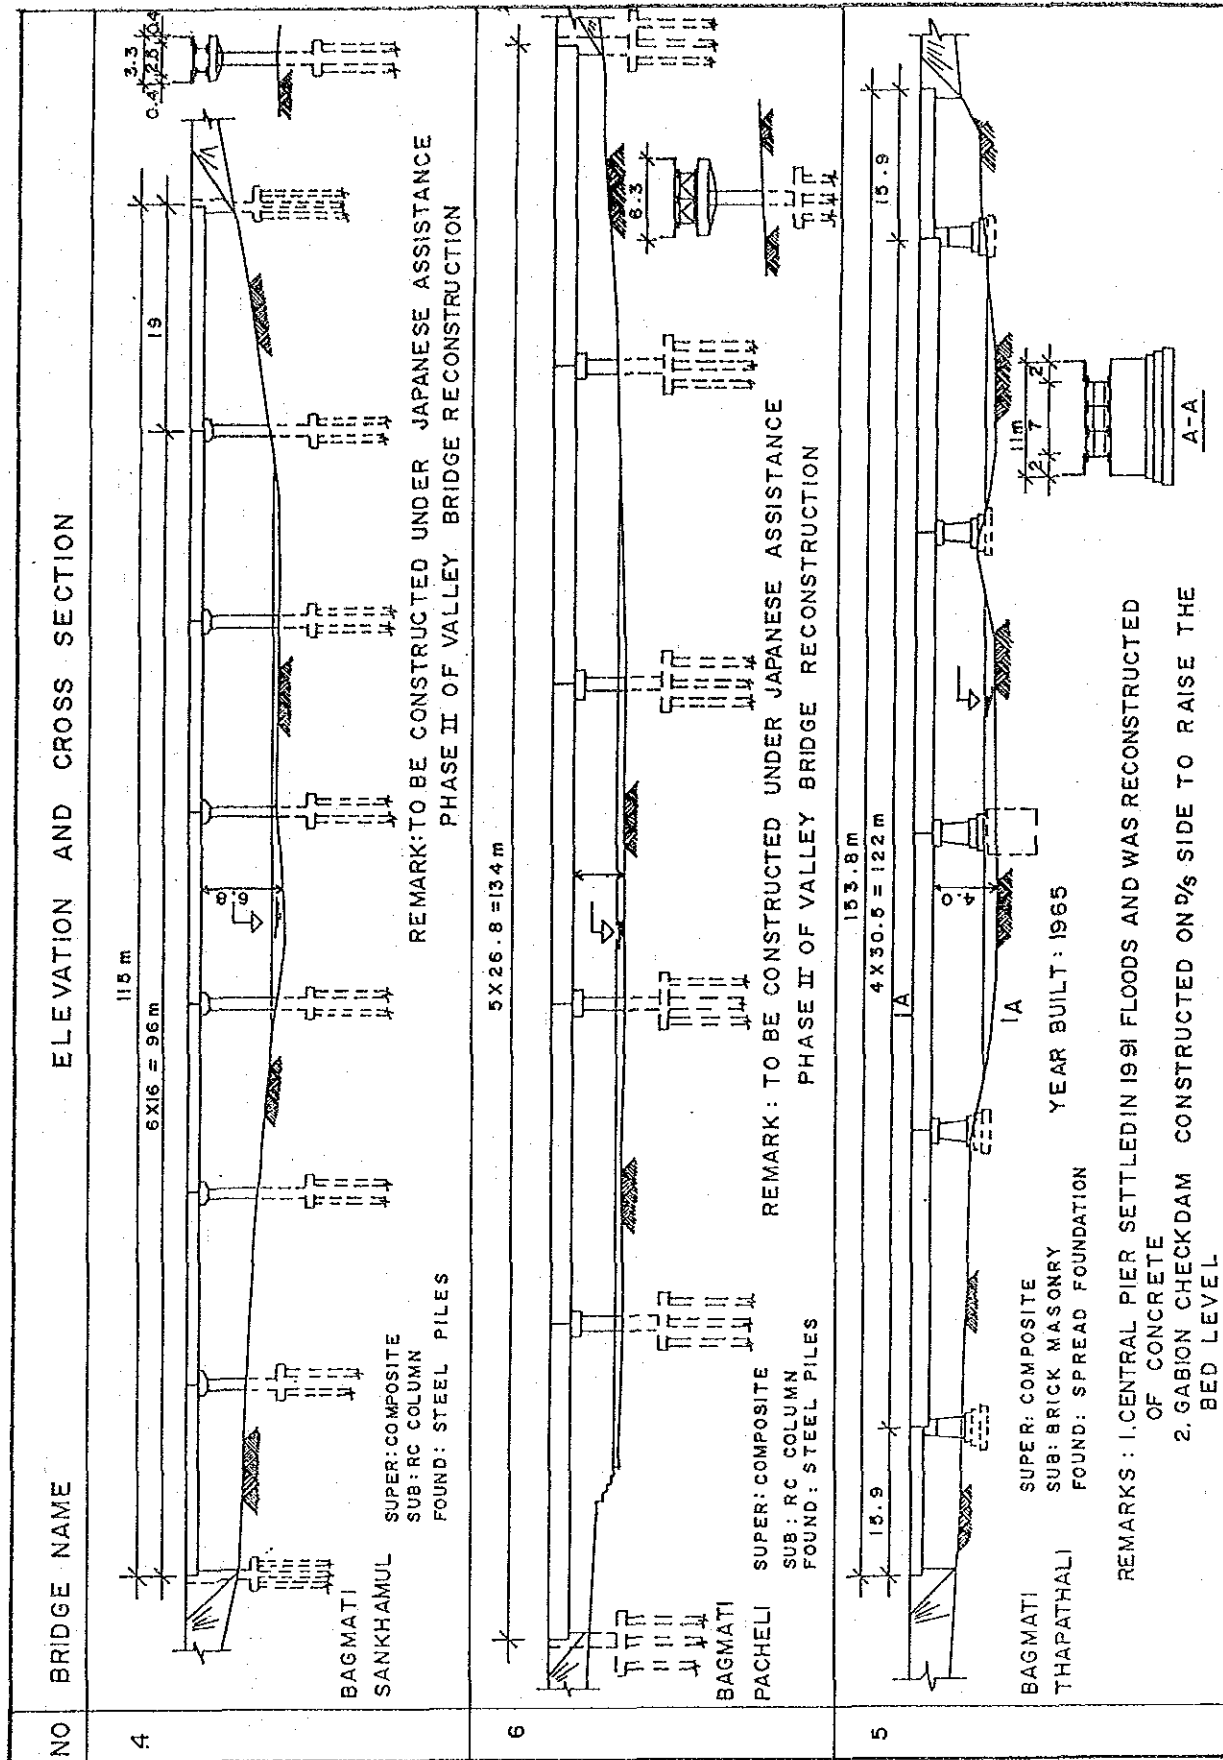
SKETCHES OF EXISTING AND PLANNING BRIDGE 2/4
